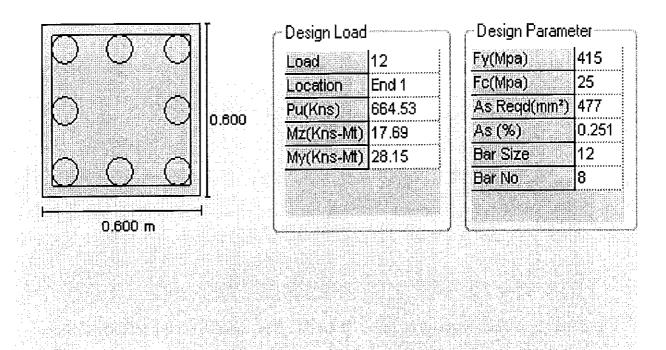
Detailing of the columns for the 4th, 5th and 6th storey in the above multi-storey building
